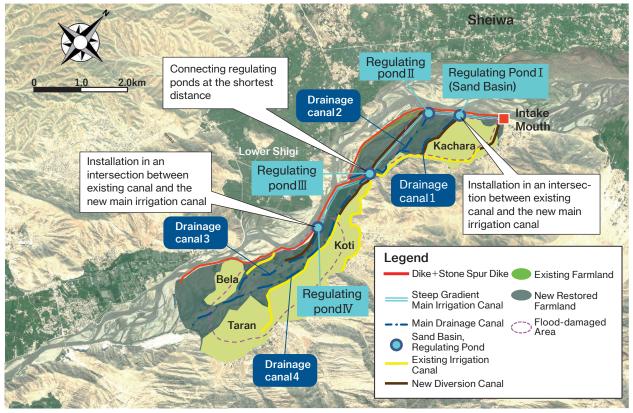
Examples of Layout Planning for the Intake Sites, Sand Basin and Main Irrigation/Drainage Canal²)
